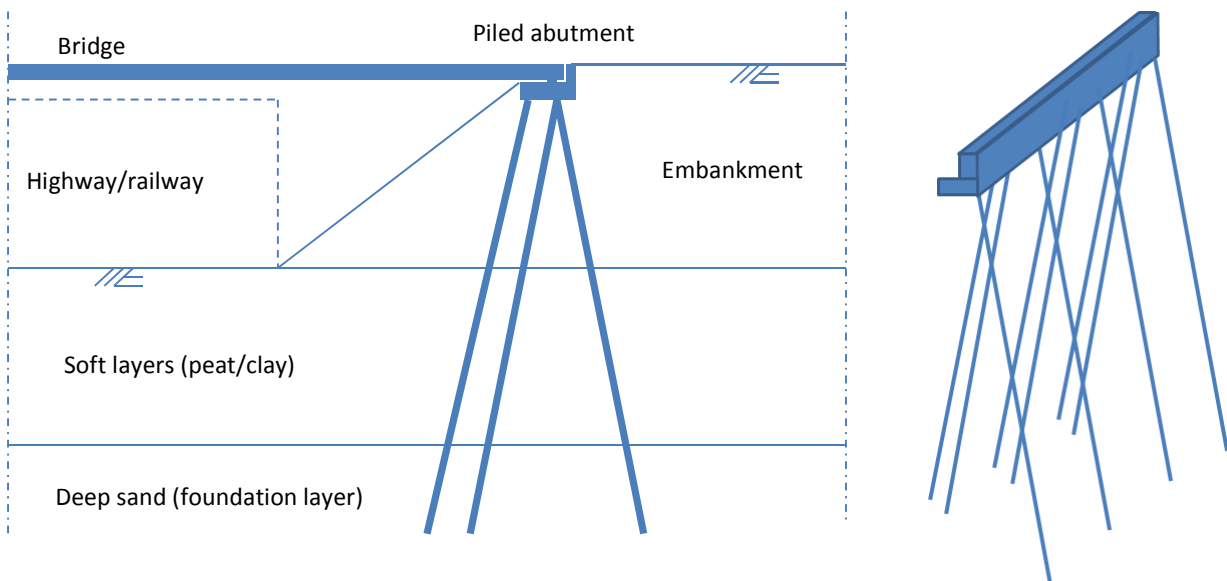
Highway crossing with piled abutment and 3D view of piled abutment
